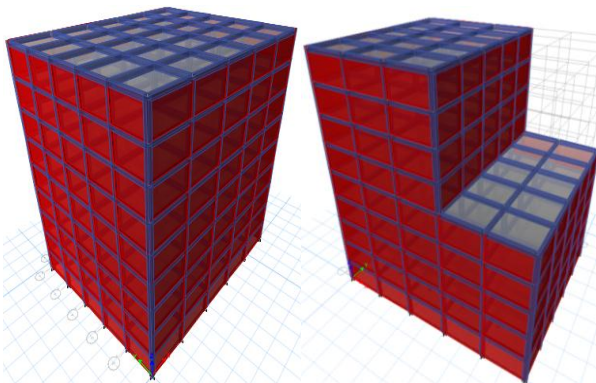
3d plan of model1 and model2 provided with infill wall respectively.
